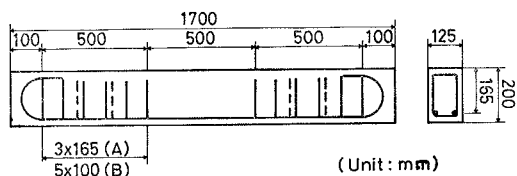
Dimensions and arrangement of reinforcement of the specimens
